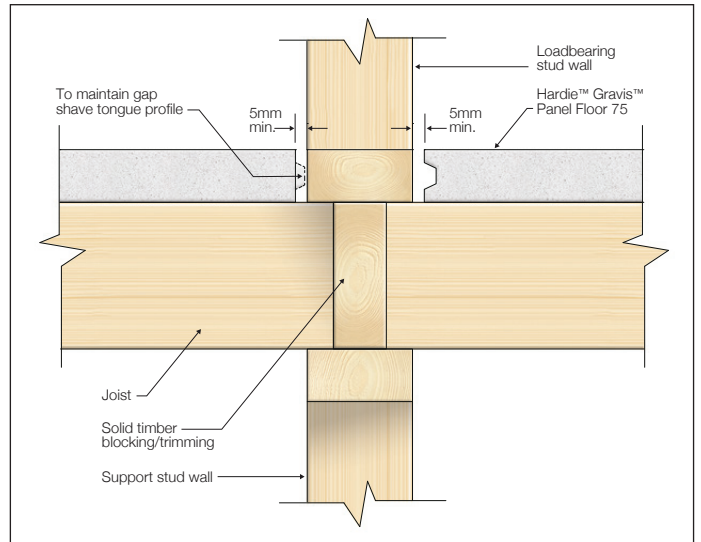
FITTED FLOOR WITH INTERNAL LOADBEARING FLOOR
